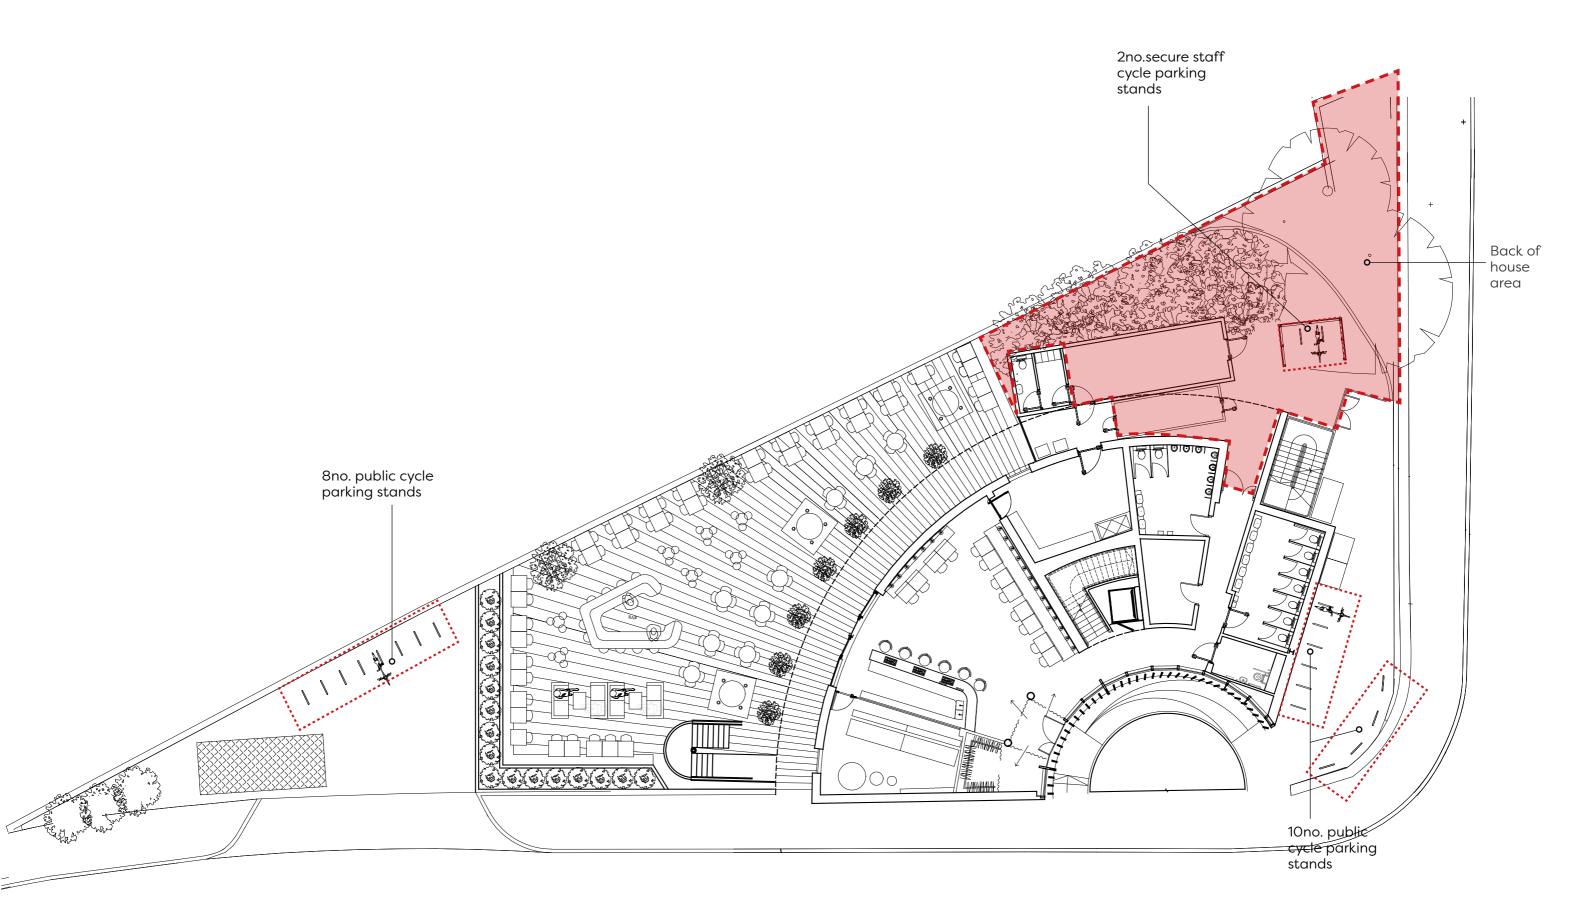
Ground Floor Plan Vehicle and Cycle Access
